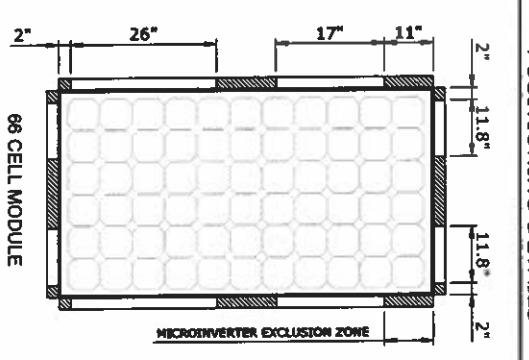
MOUNTING CLAMP POSITIONING DETAILS
